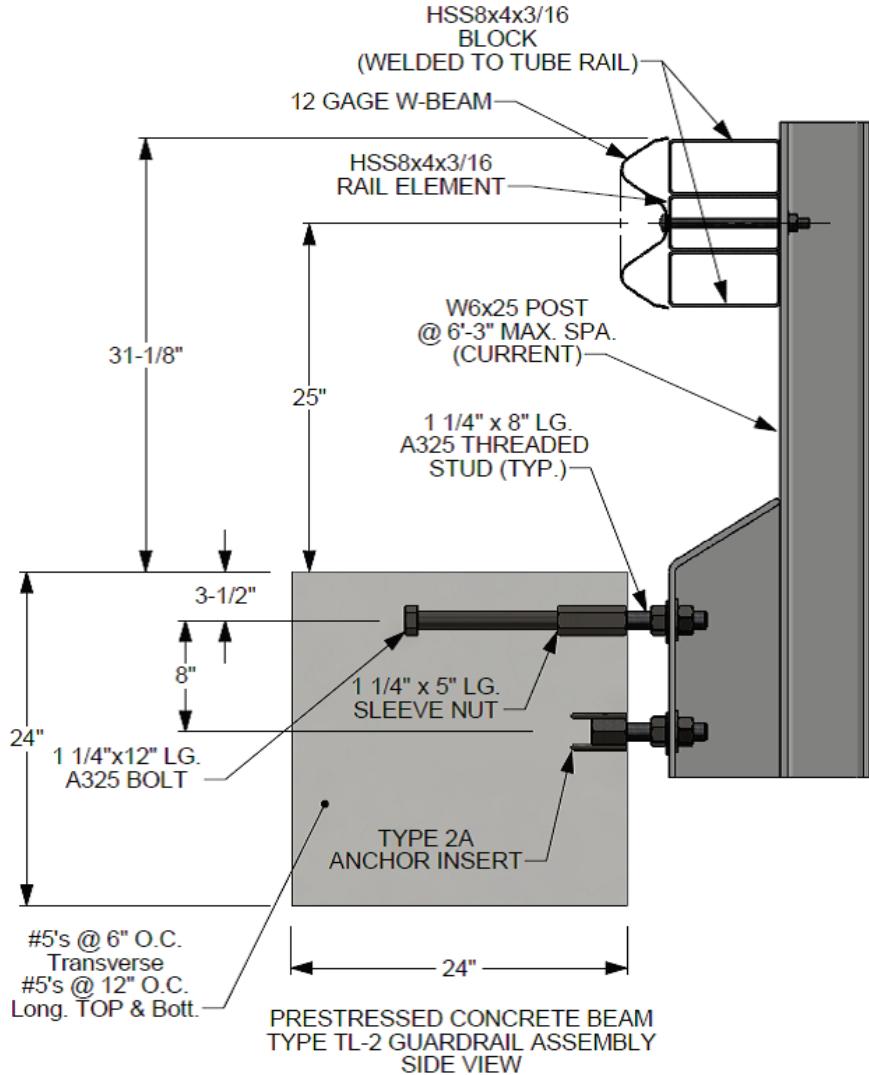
West Virginia DOT Pre-stressed Concrete Beam TL-2 Guardrail (6 ft-3 inch Post Spacing) at 31-inch Height
